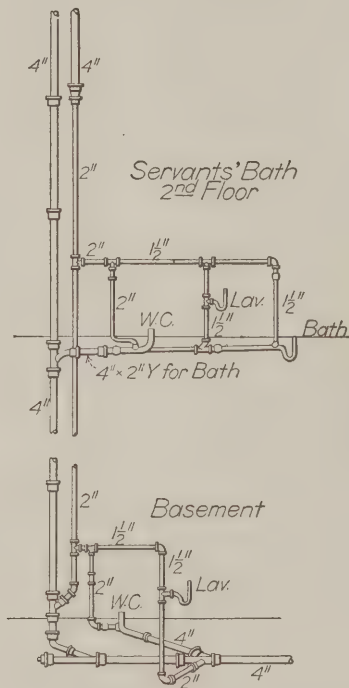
Elevation of Stack No. 3, Showing Connections to Bathroom and Basement Toilet Room
